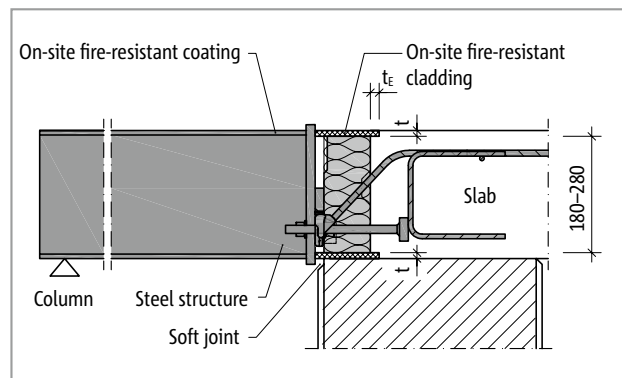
Schöck Isokorb® T type SQ: On-site fire-resistant cladding of the connection when using steel structures with fire-resistant coating; section
